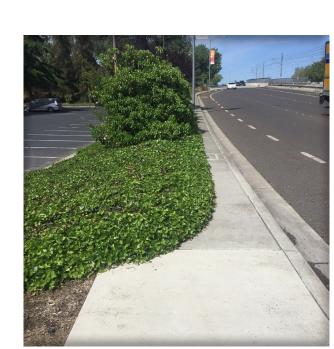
Landscaping encroaching onto the sidewalk in Milpitas
